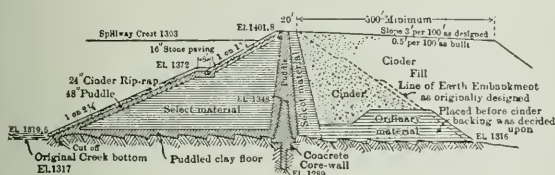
Maximum Cross Section of Hinckston Run Dam.
